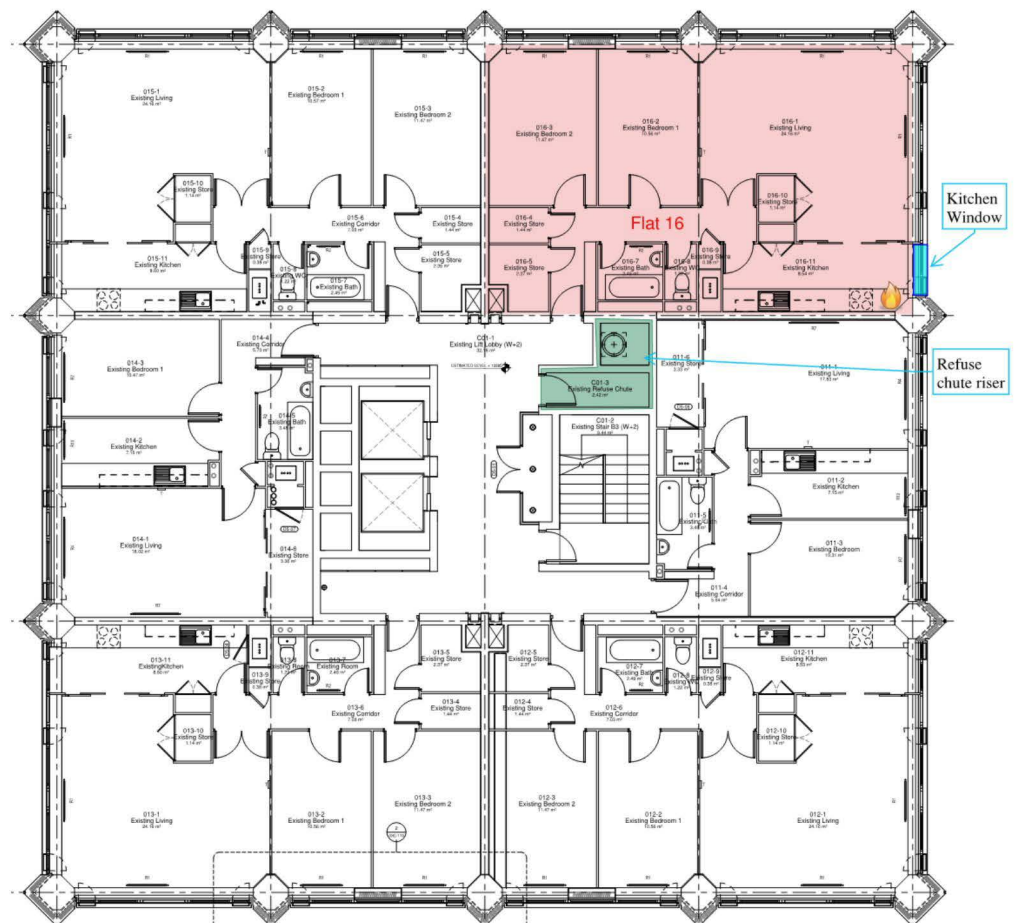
Architectural floor plan - Flat 16 location [SEA00010474]
